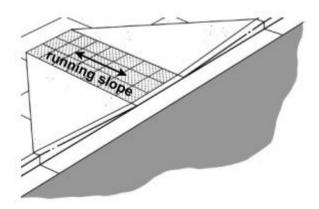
Running Slope (Source: ADA Accessibility Survey Instructions Manual)
